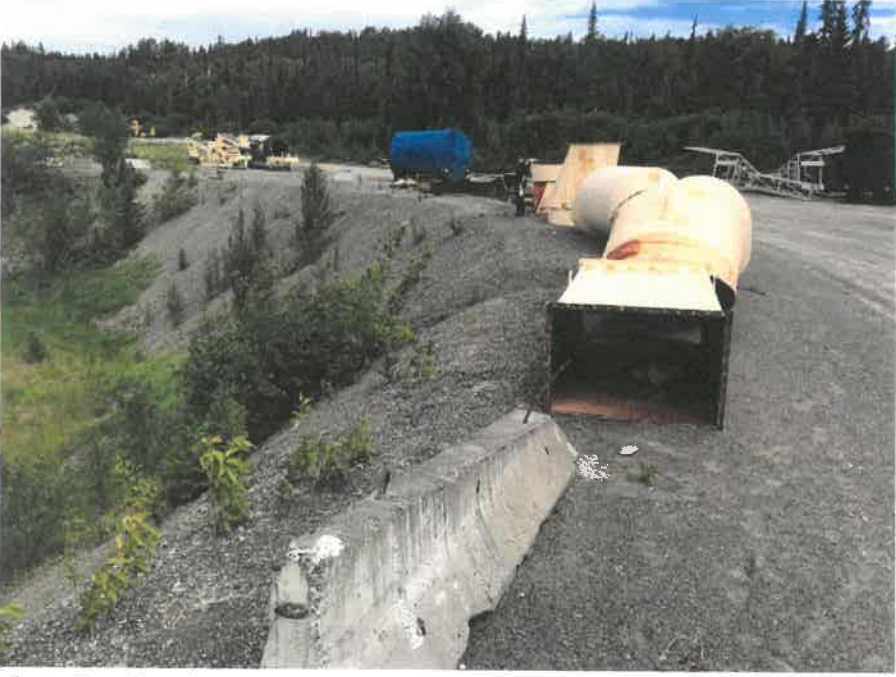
Ahead of Photo 1 at top west edge of Boneyard site
